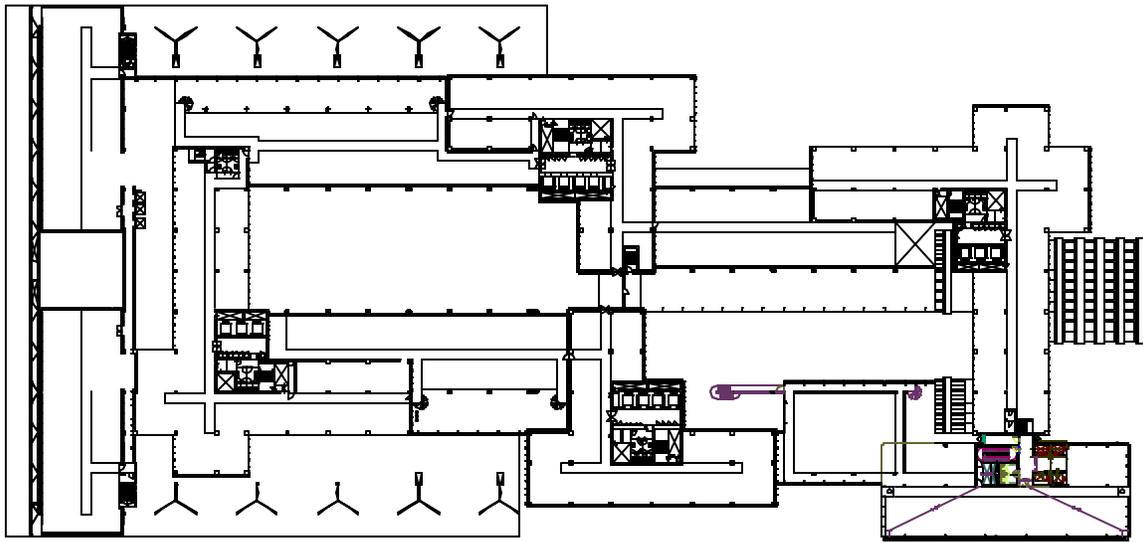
Fourth Floor Plan of WTC, not to scale (courtesy of KPFI)
